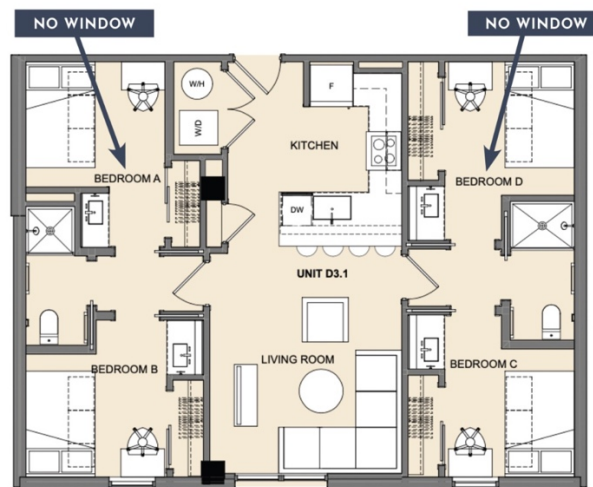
A floorplan for a 4-bedroom, 4-bathroom unit at Legacy on Rio, 2614 Rio Grande St. Austin, TX 78705.⁷⁷
